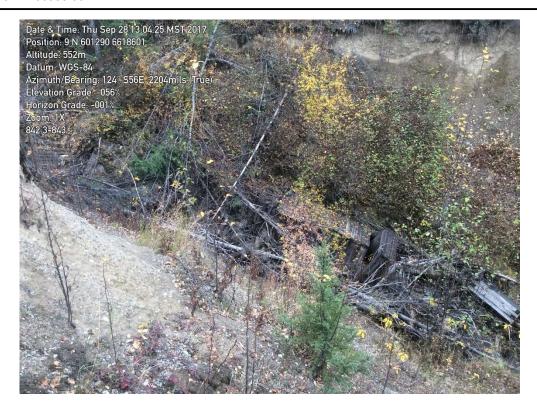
Site 2 (Km 841.95 to 844.40) – Timber Box Culvert - Photo 1 of 3
